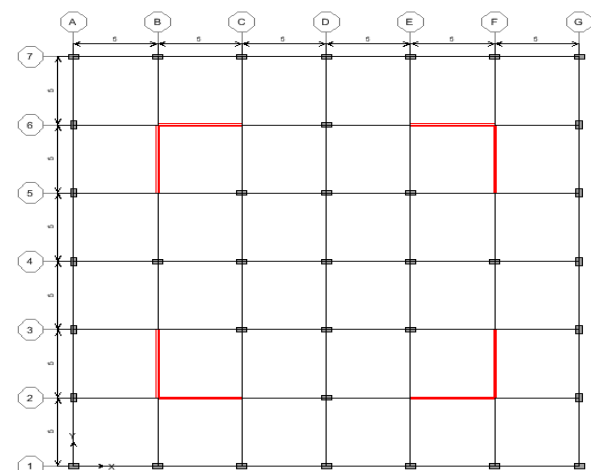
Model 3: Regular Building with Shear Wall at Position 2
